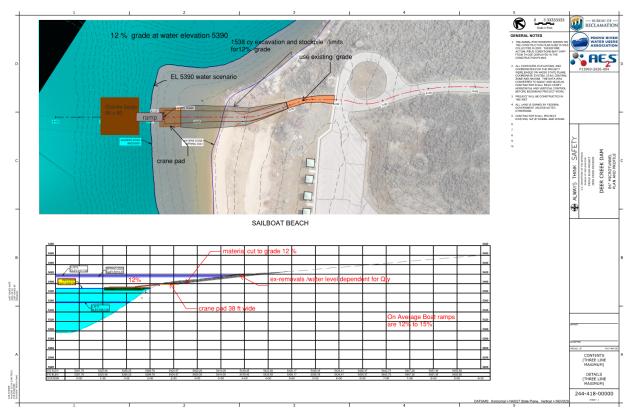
Sailboat Beach Access with Steel Ramp to Barge
